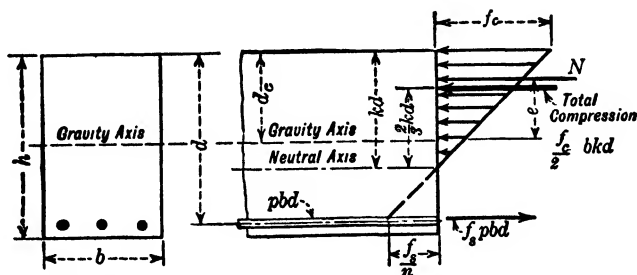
Section with Steel in Tension Face Only. (See p. 185.)
